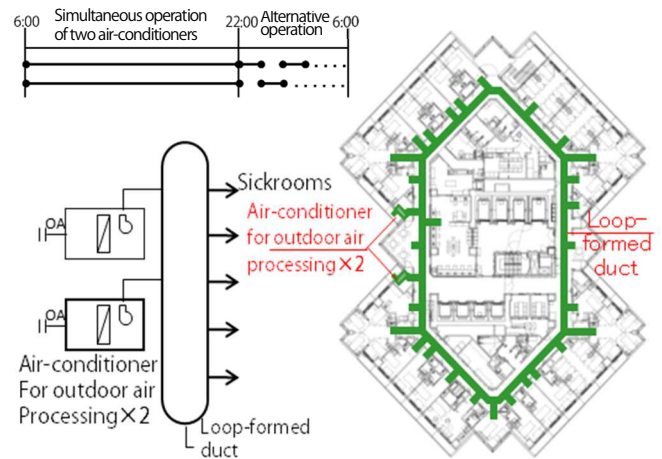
Outdoor air processing duct diagram and plan of ward floor
